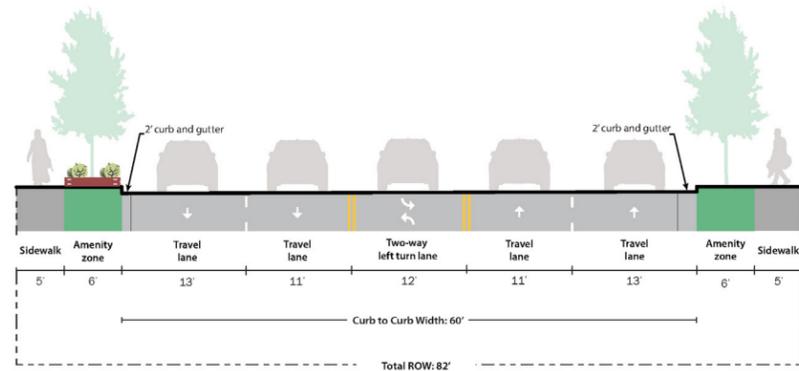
Section I (72nd Avenue West of Clay Street – Looking East)
